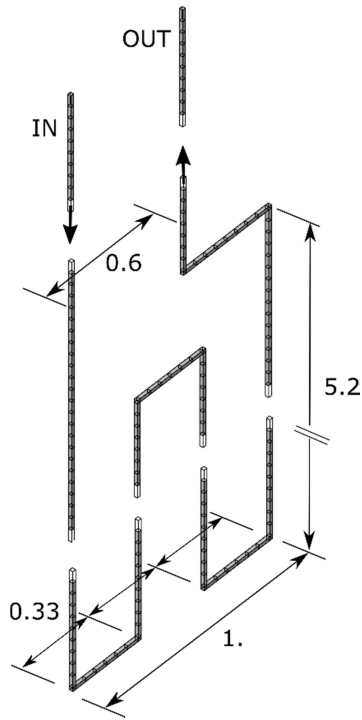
Layout of the enhanced Single-W heat exchanger pipe (units m)
